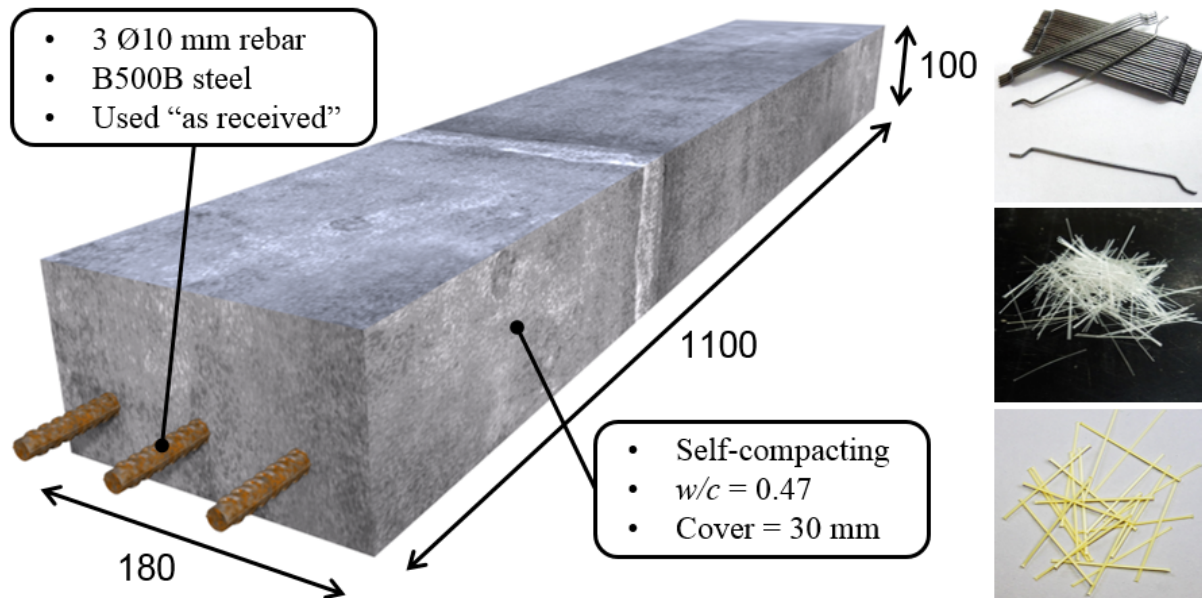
Specimen geometry, reinforcement layout and fibre types. Measurements in mm.
